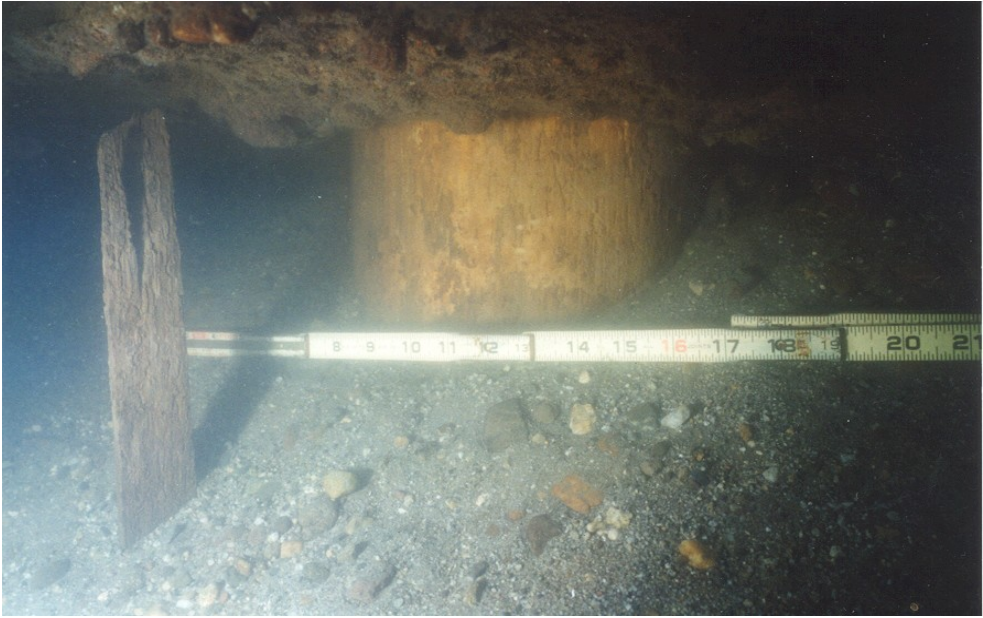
Pier Undermining, Exposing Timber Foundation Pile
